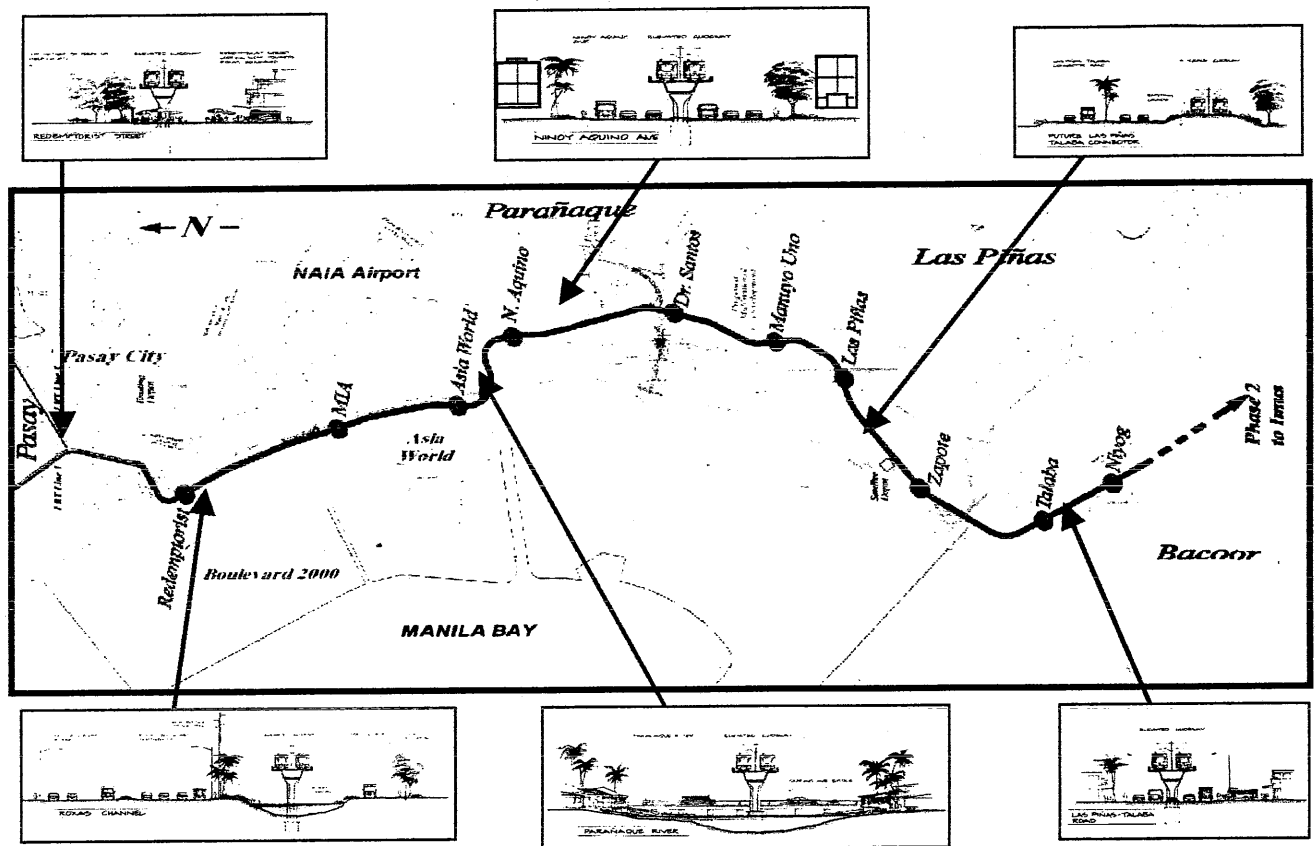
Plan Showing the Layout of the LRT and the Extent of the Reclaimed Land
